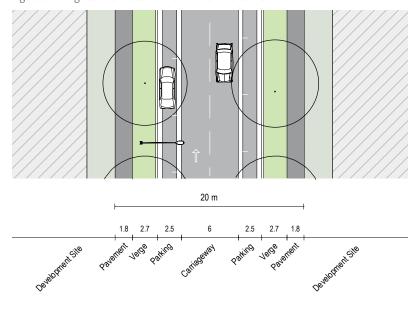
Figtree Avenue & Parkview Drive – Indicative Plan
